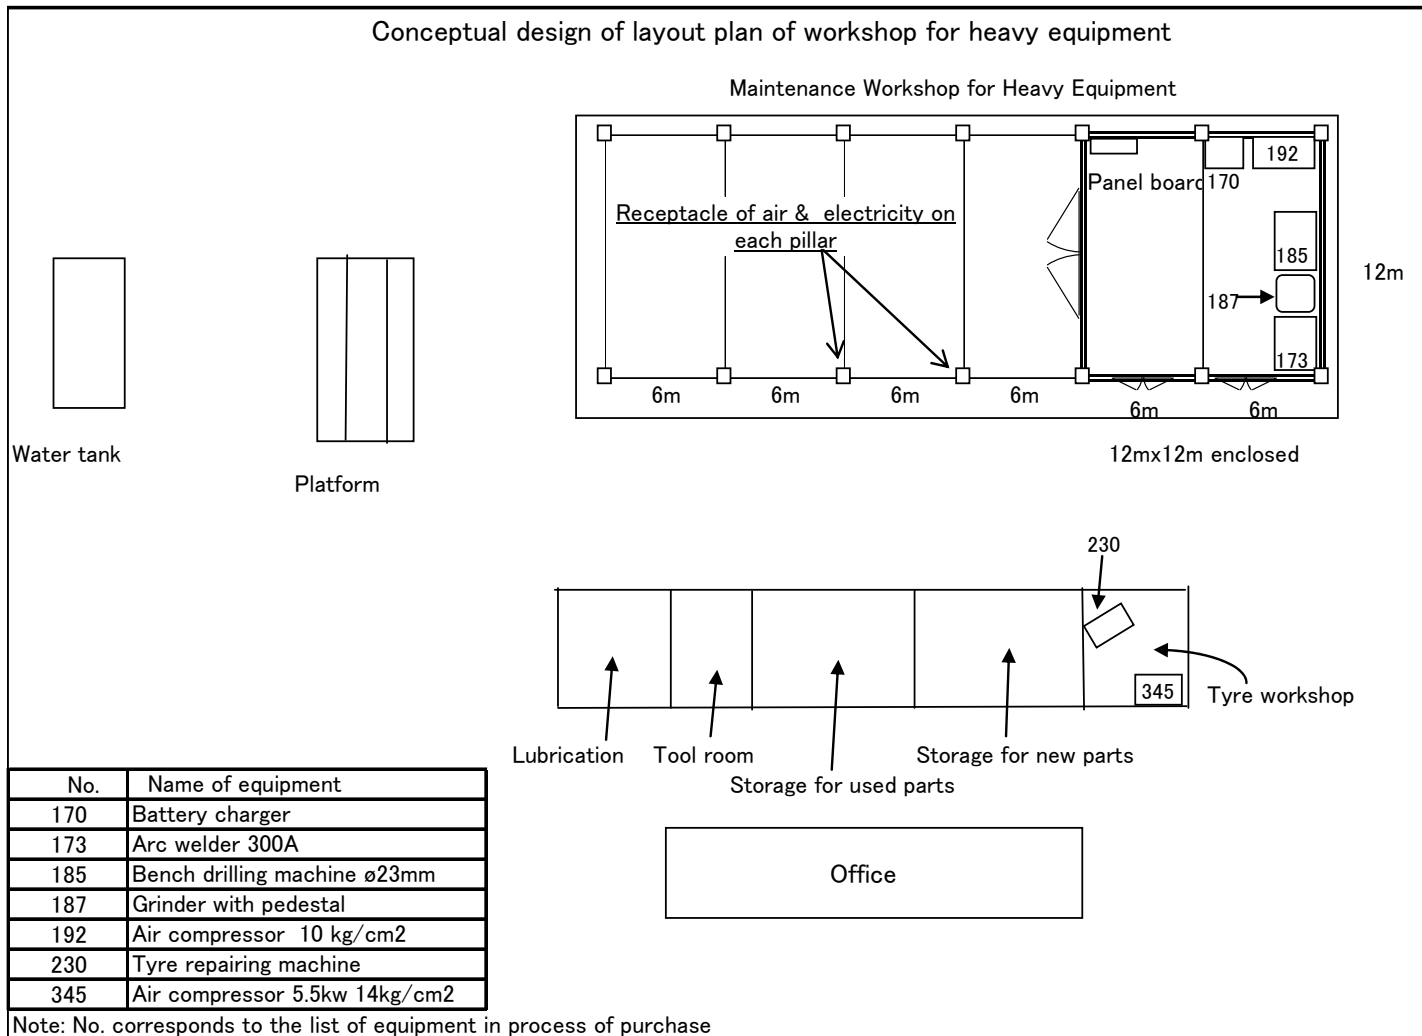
Design Concept for Heavy Equipment Installation at Workshop
